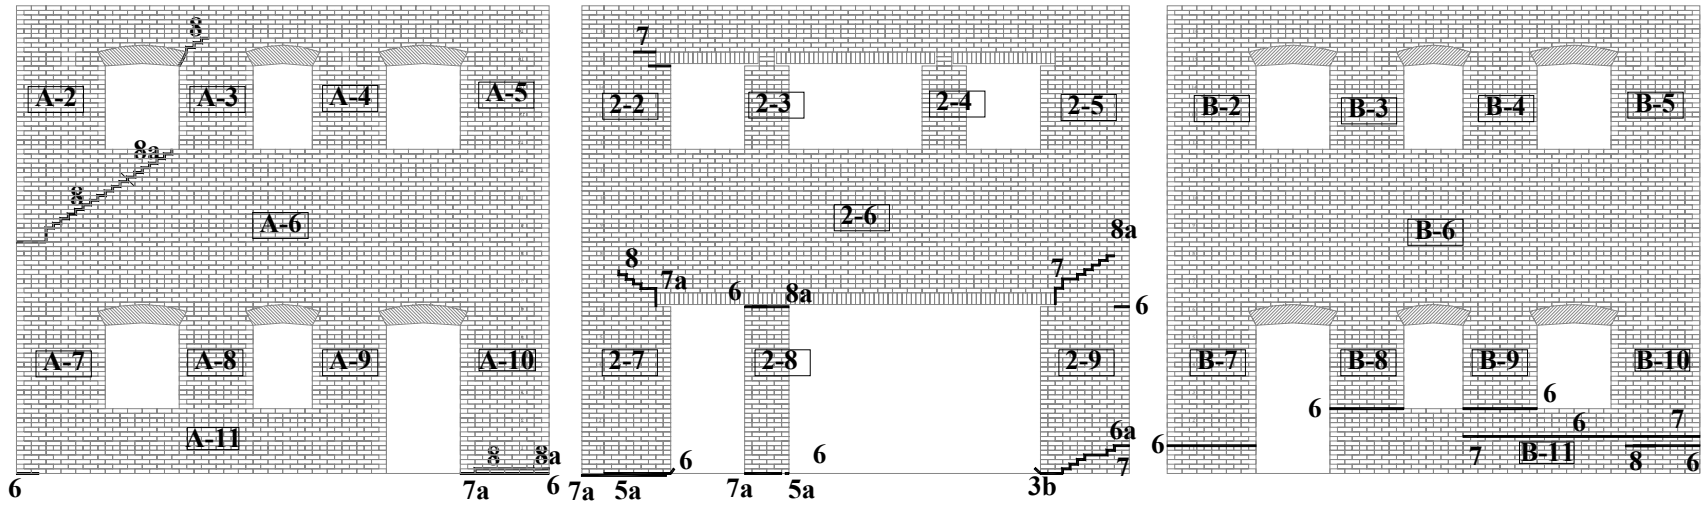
Crack pattern of Wall 2 and adjacent Wall A (left) and Wall B (right) at the end of Cycle 8a. The crack number corresponds to the test run number. Number IDs of each pier are given in the rectangles.
